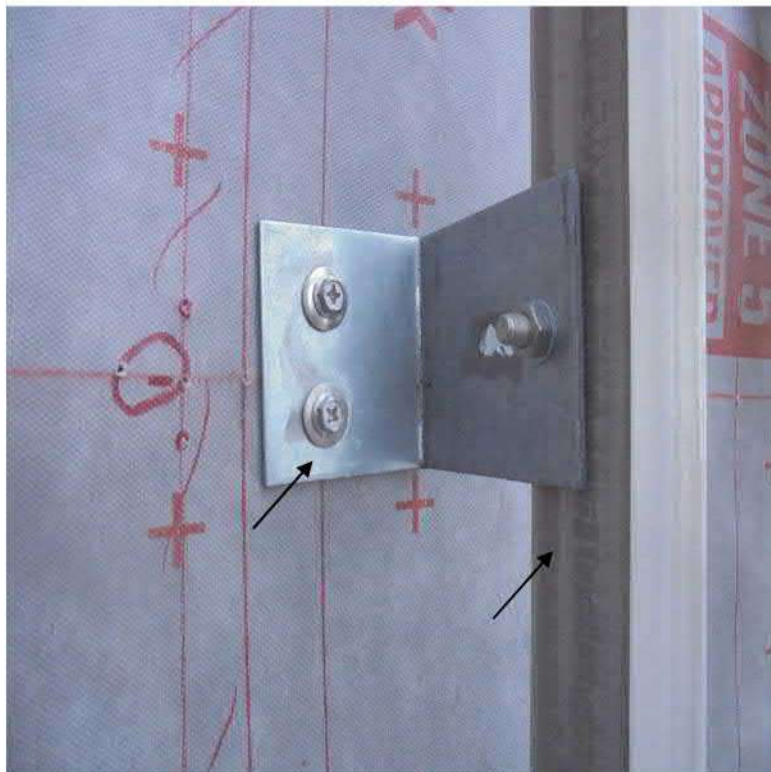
Alubond RFS wall bracket and Alubond RFS aluminium runner
